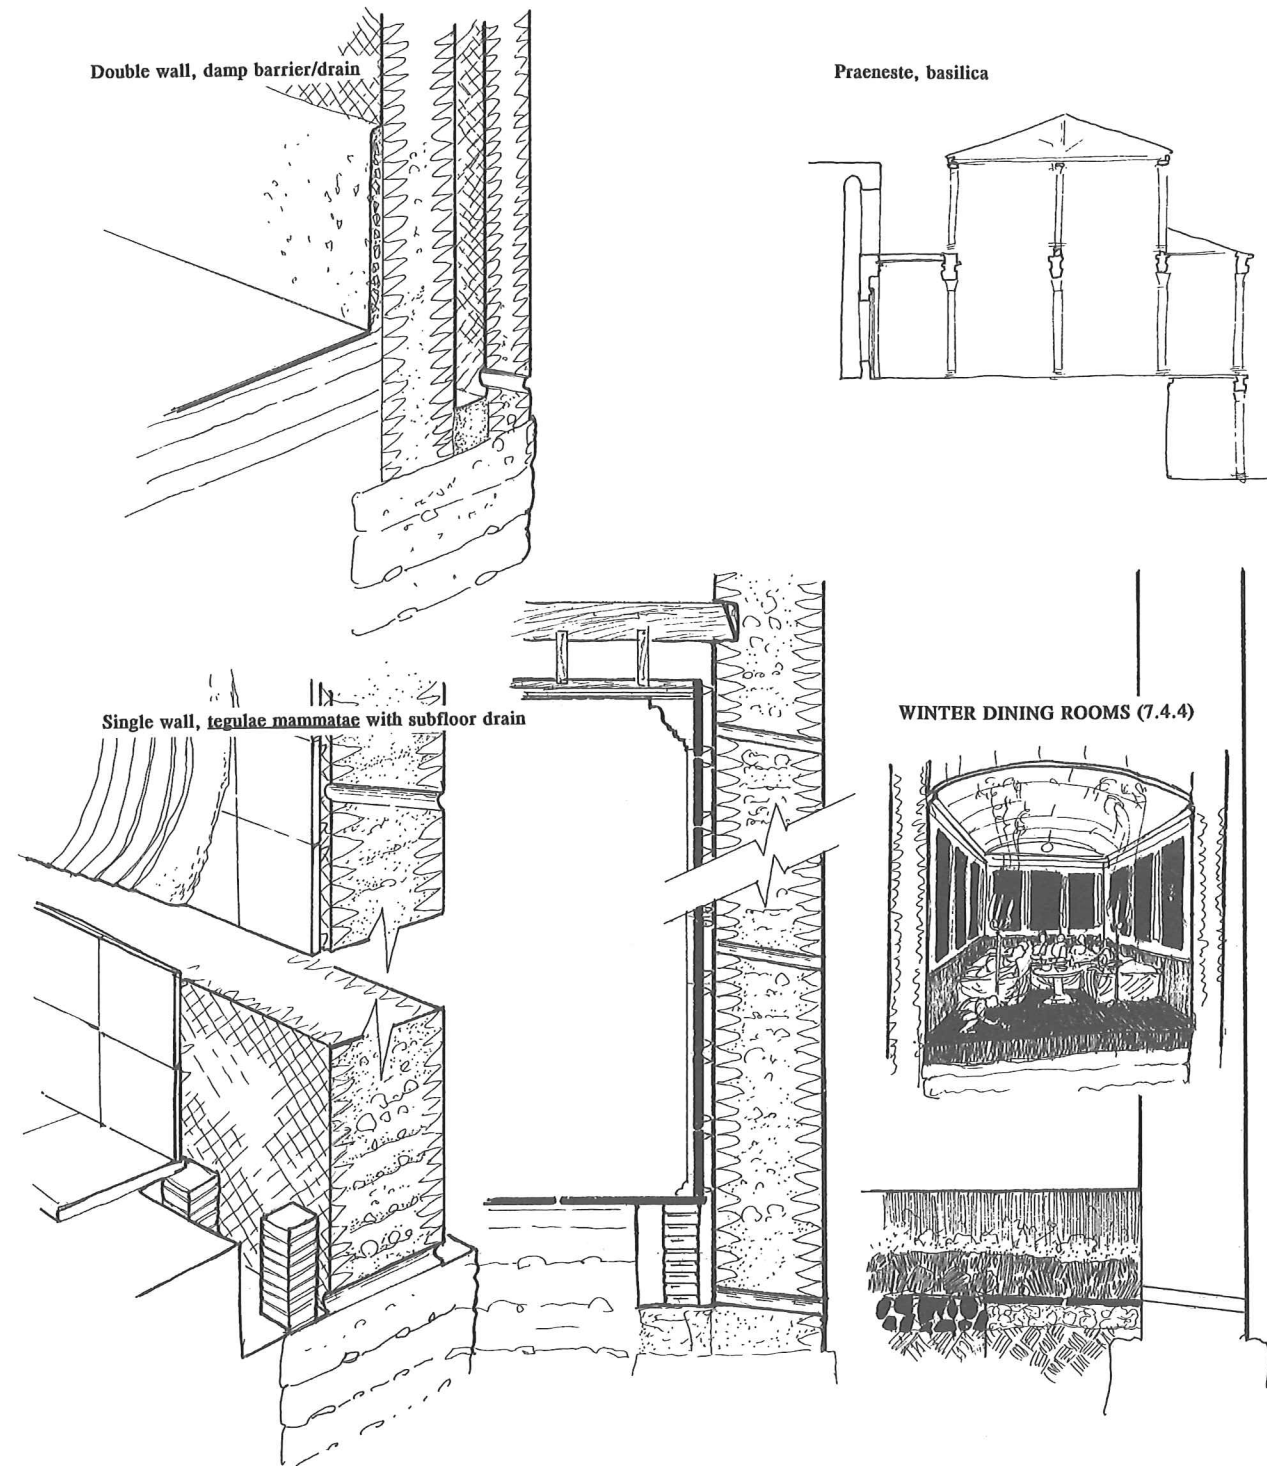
Plasterwork in Damp Locations (7.4.1-3).
